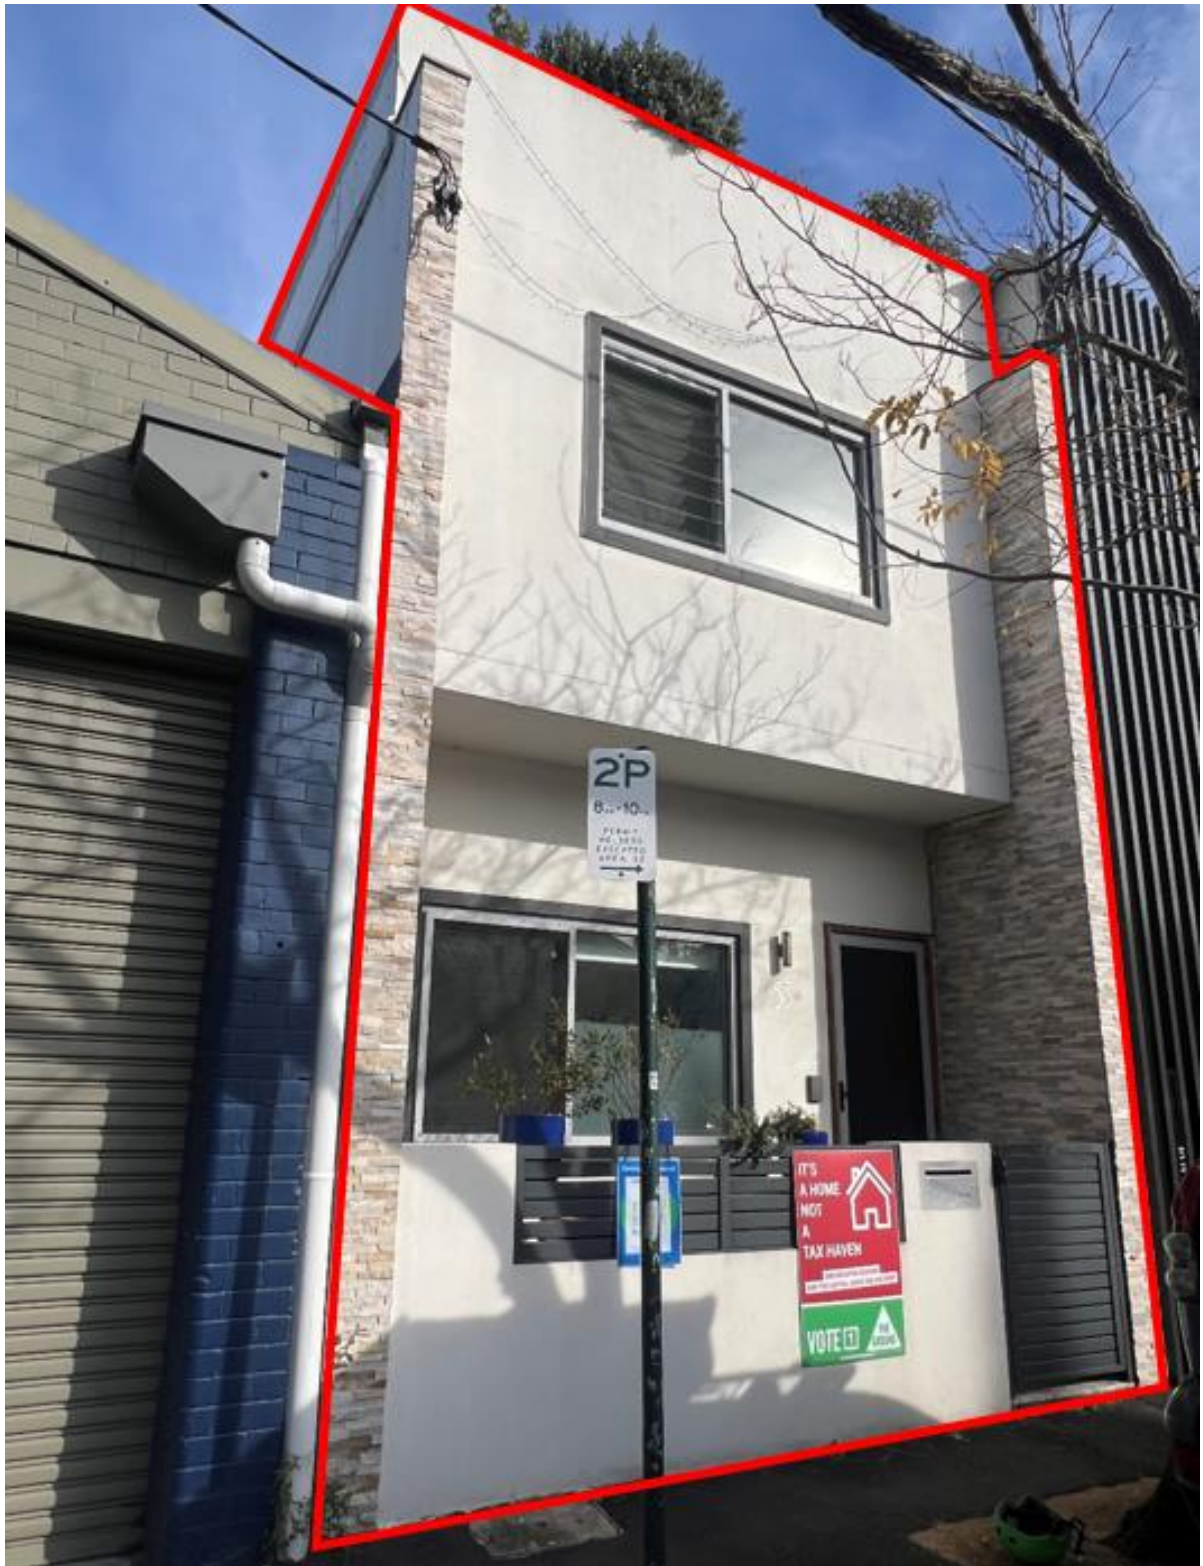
Site viewed from Vine Street facing south, subject property outlined in red
